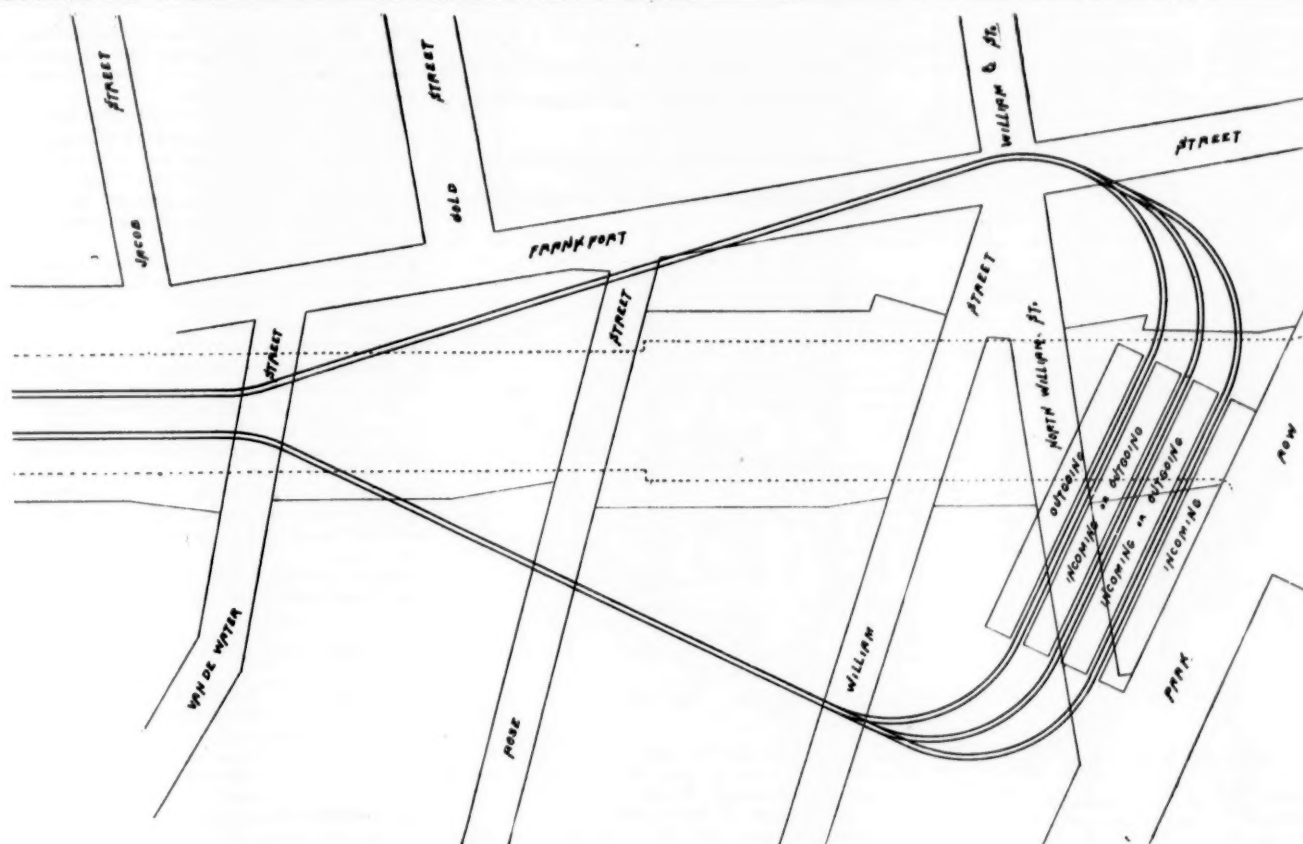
PROPOSED NEW YORK TERMINAL, NEW YORK & BROOKLYN BRIDGE RAILWAY.
